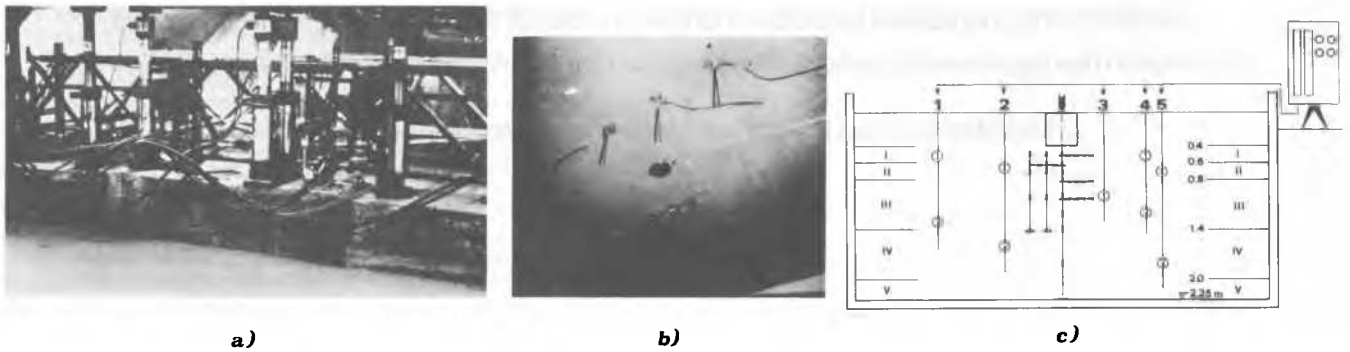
Model tests: a) Strip footing and hydraulic loading installation. b) Vertical and lateral deformation gauges inside the sand. c) Cross section of deformation gauges, \odot ...pressuremeter test location.
